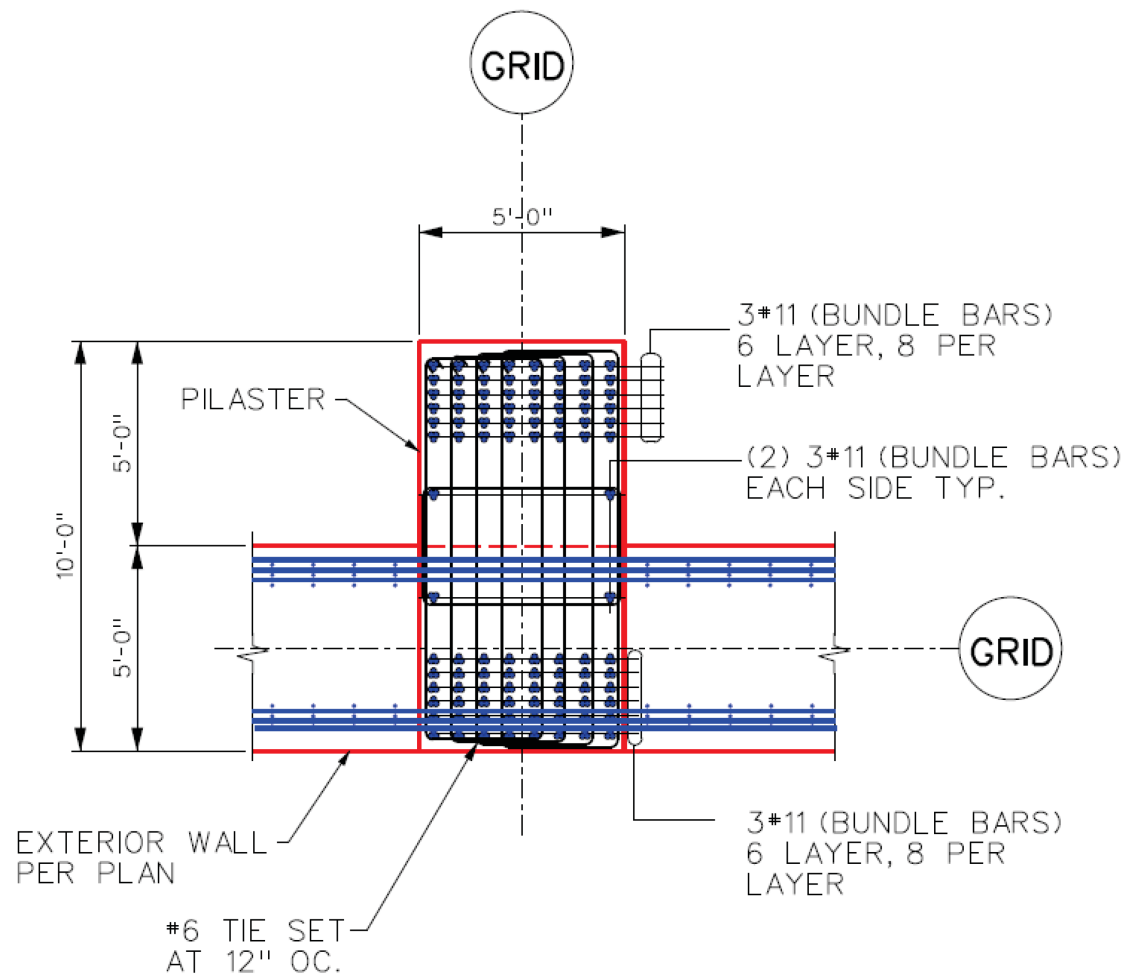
B-36: RXB Reinforcement Detail for Pilaster Type 5
